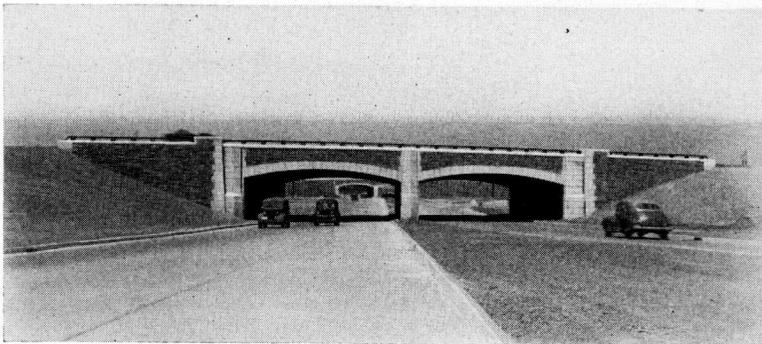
Bridge 10, a Double Span Rigid Frame Structure
